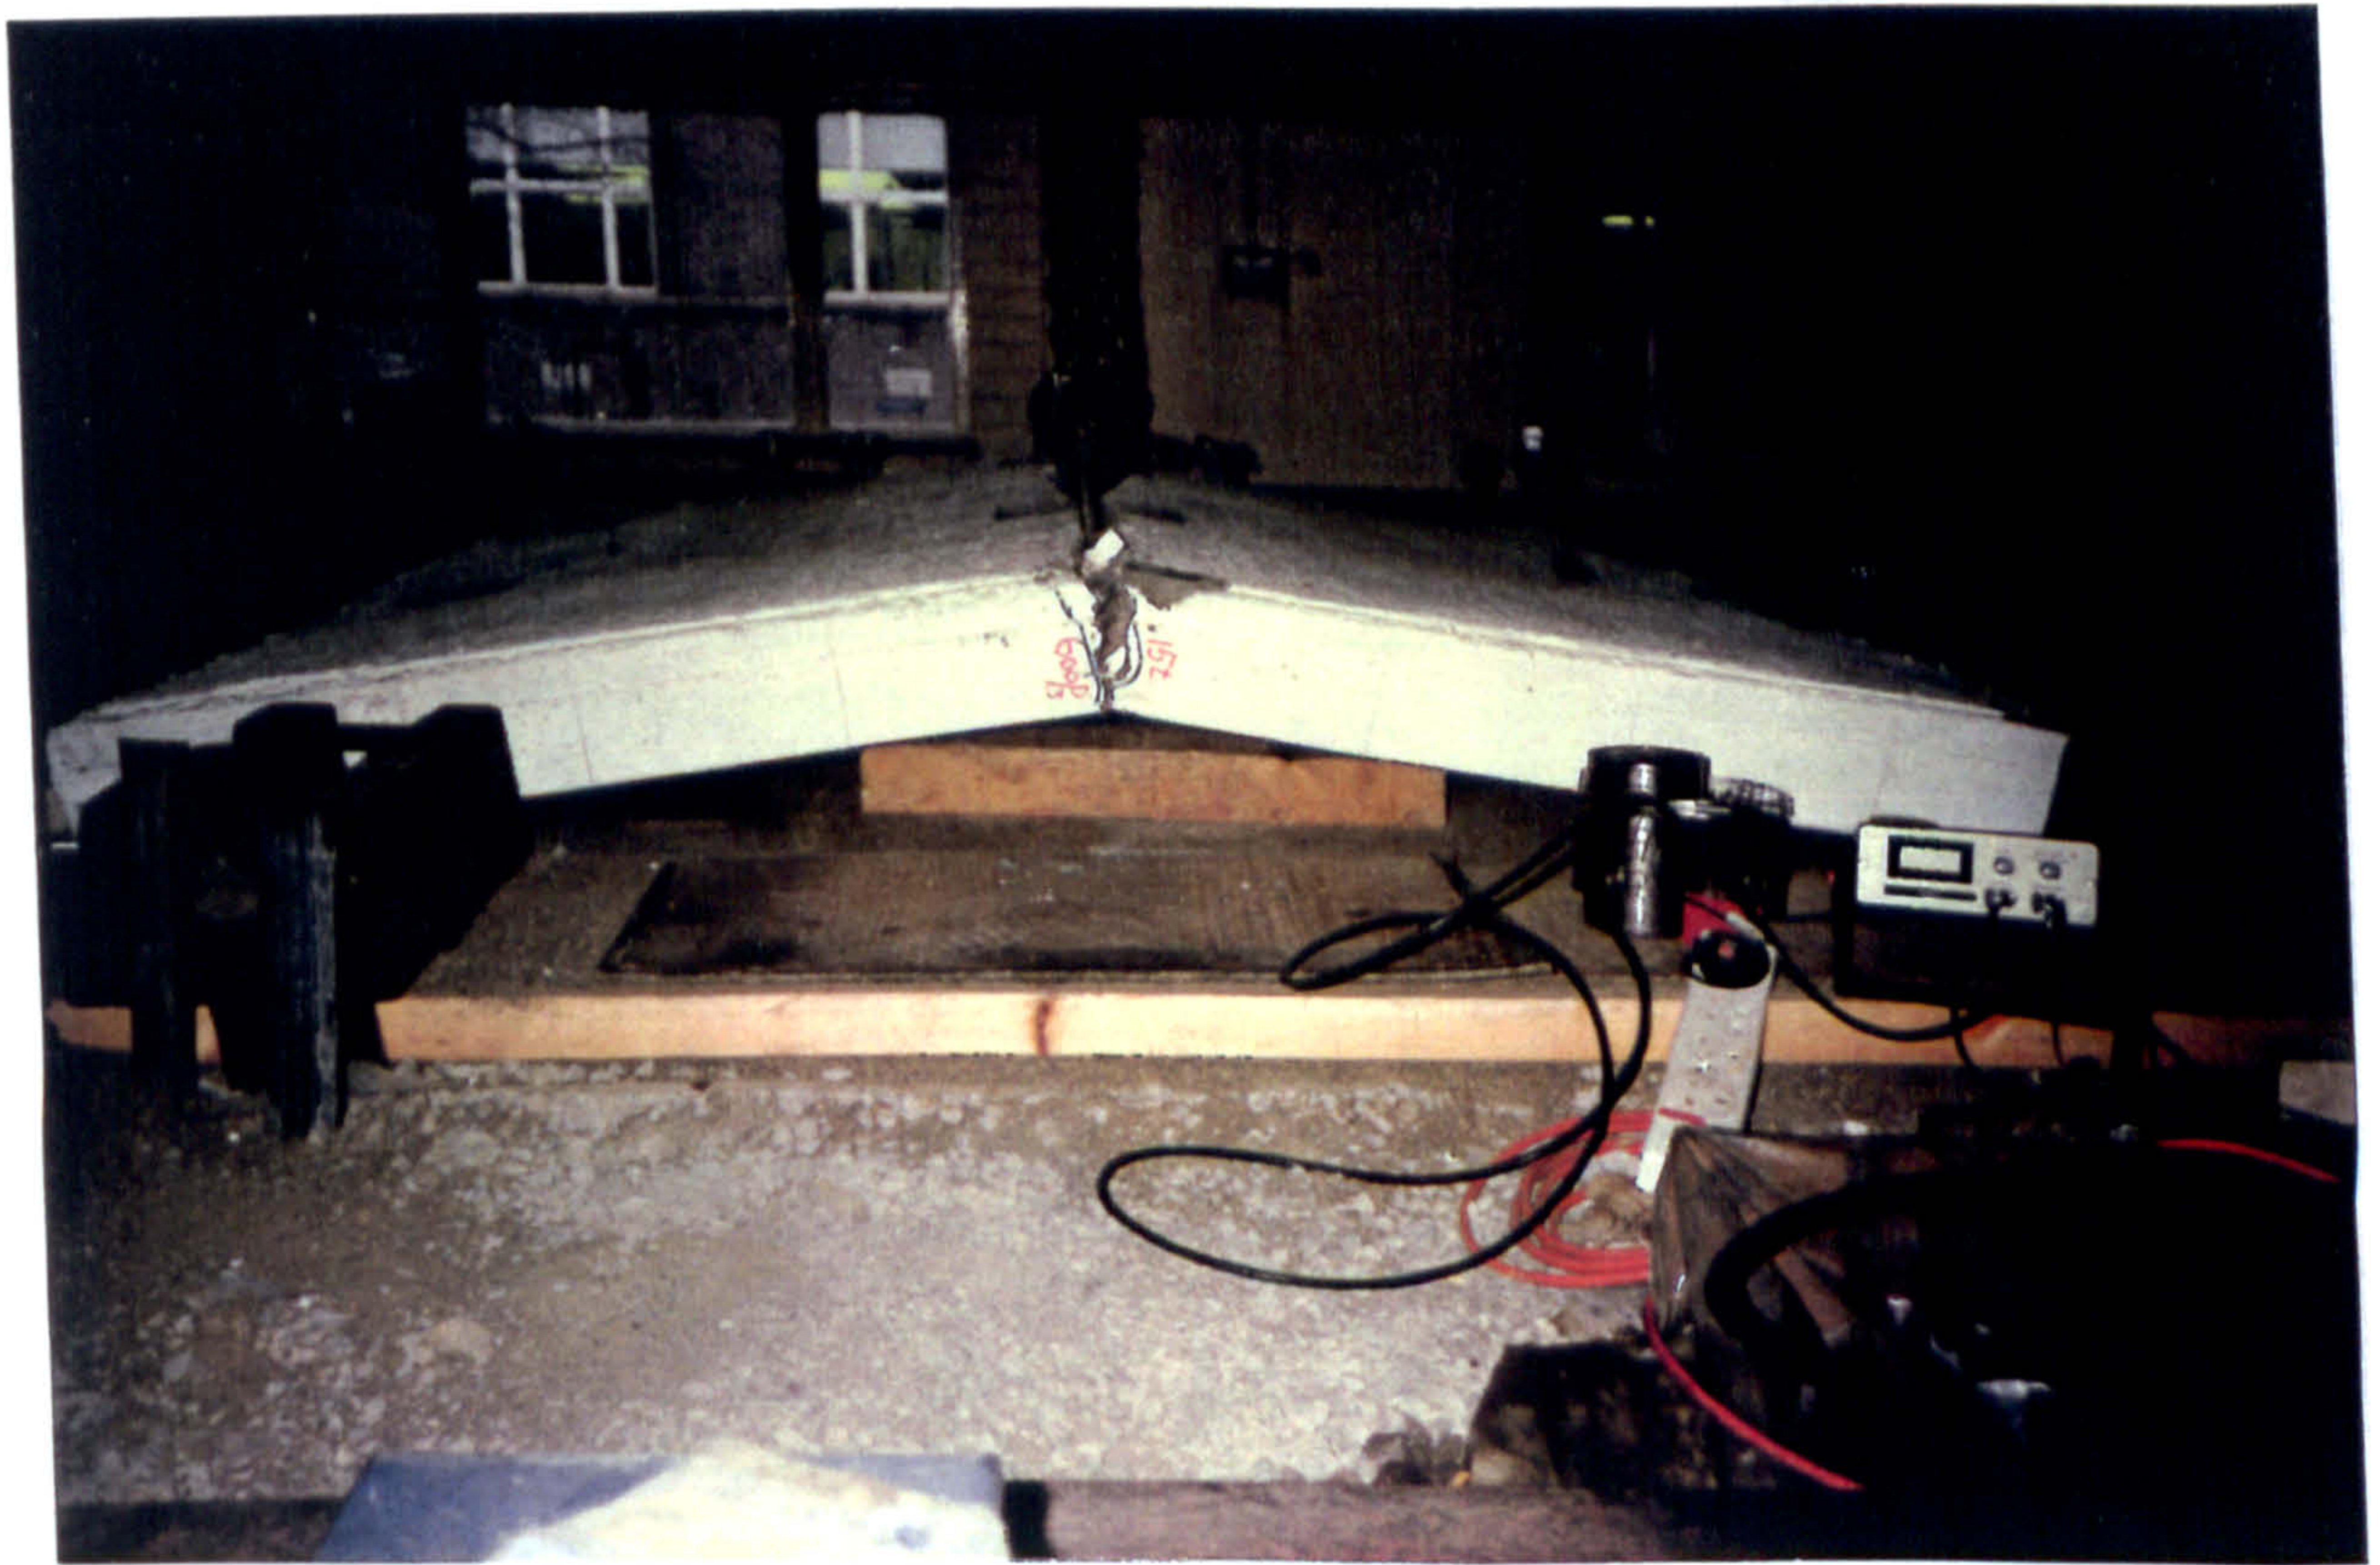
Transverse Main Crack at Failure, Raft RSF - Module M2
